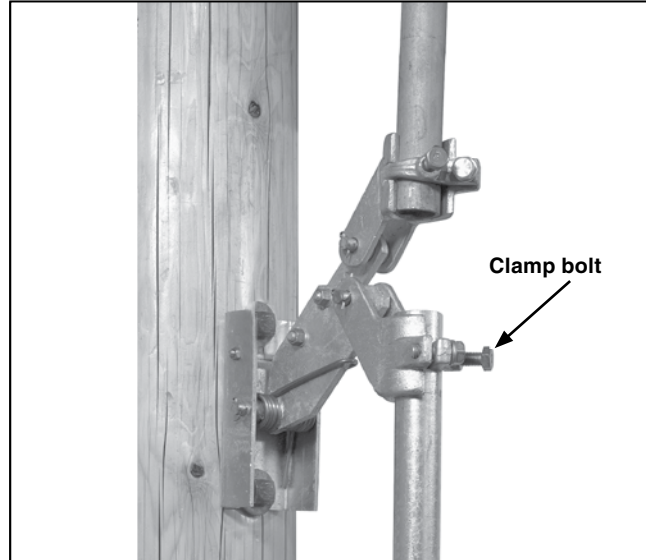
Torquing the clamp bolt at the lowest rod guide (or switch operating lever) coupling.
